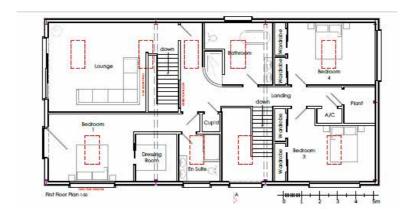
Proposed Planning Drawing Plans and Elevations, drawing number 21440, 02 G, by Vertex Architecture
